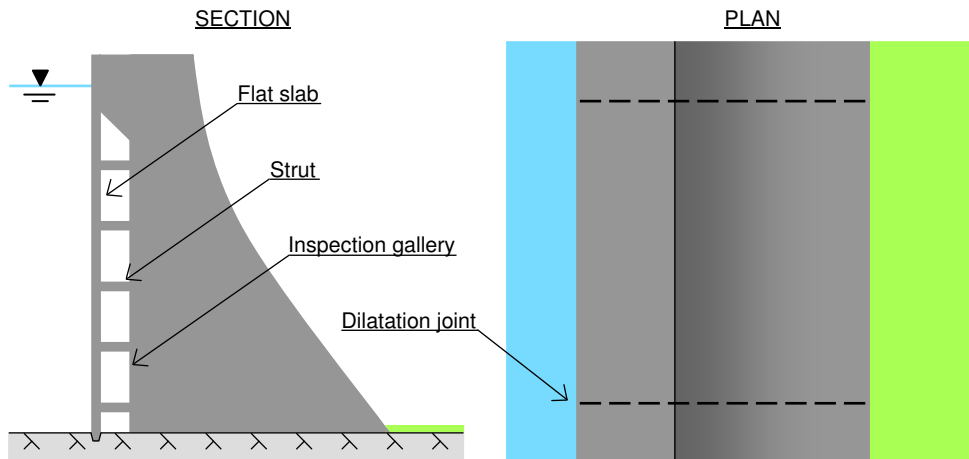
Section and plan of a solid gravity dam with flat slab.
